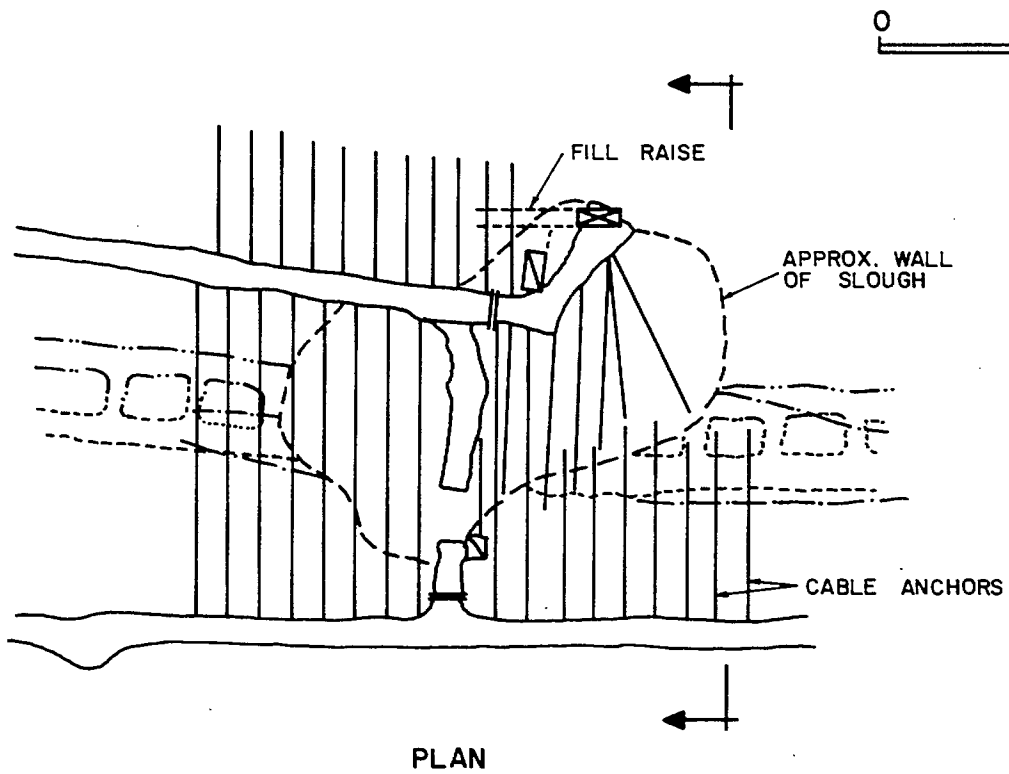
Layout of Rock Anchors in a Canadian Underground Copper Mine (10, 11).
